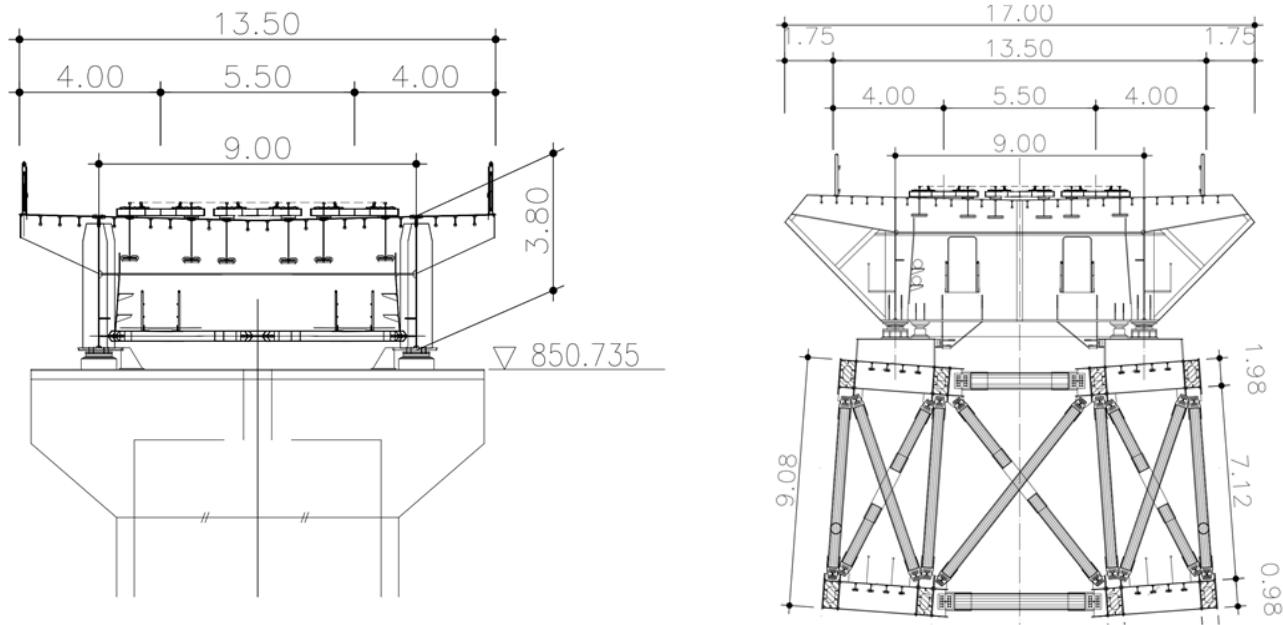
Cross sections, Viaduct bridge on left and Arch bridge on right
